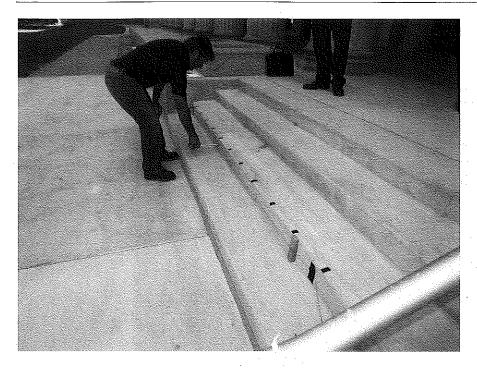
Overall photo at north section Stairway A, measurements of second riser
